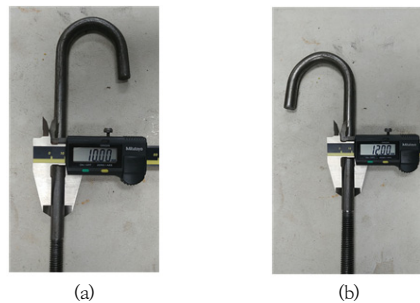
M10, M12 J-type hook anchor bolts specimens
